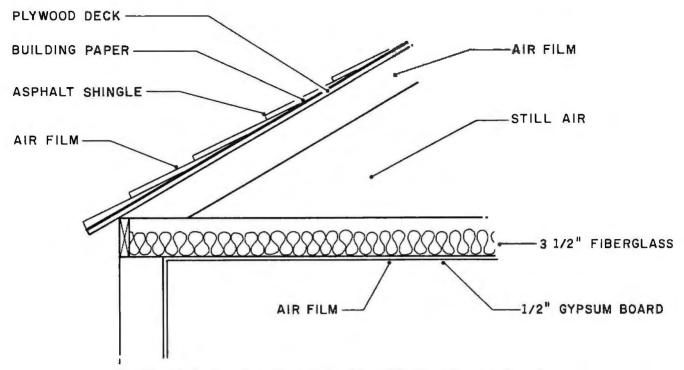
Construction of the ceiling and roof of the house shown in figure 2.
